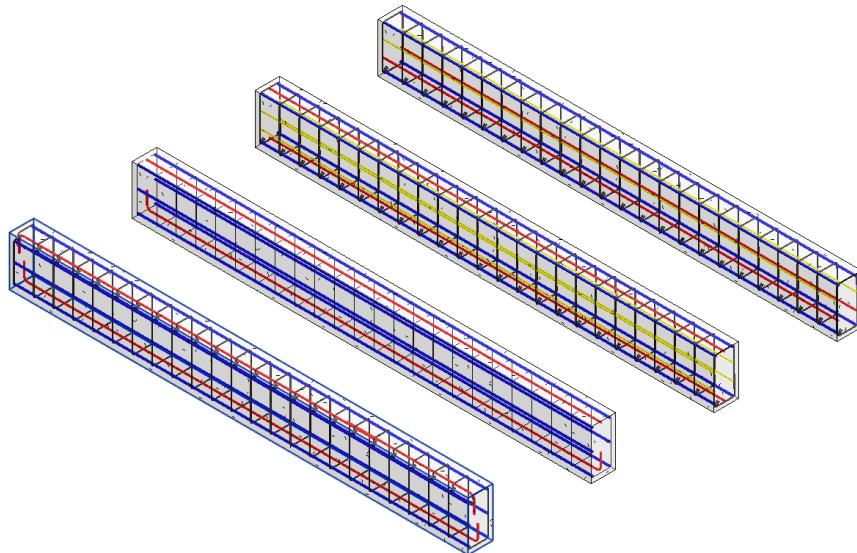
REINFORCED CONCRETE BEAM SAMPLES
